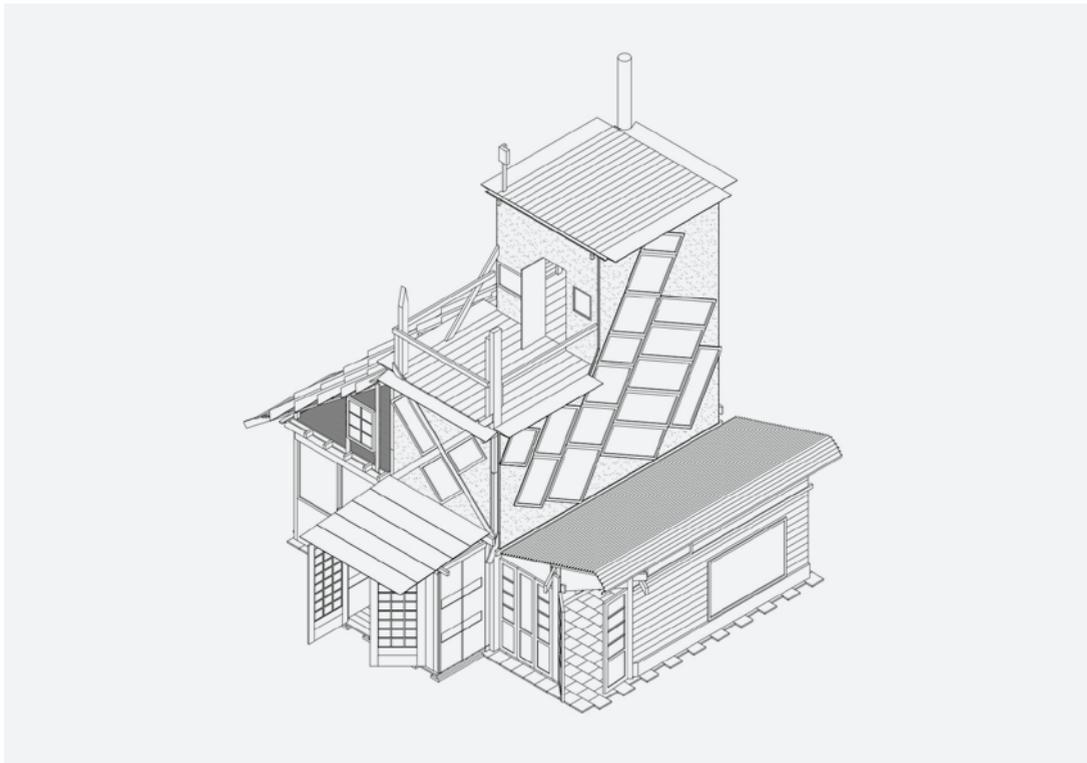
ADM, axonometric drawing of the Pizza Tower.
